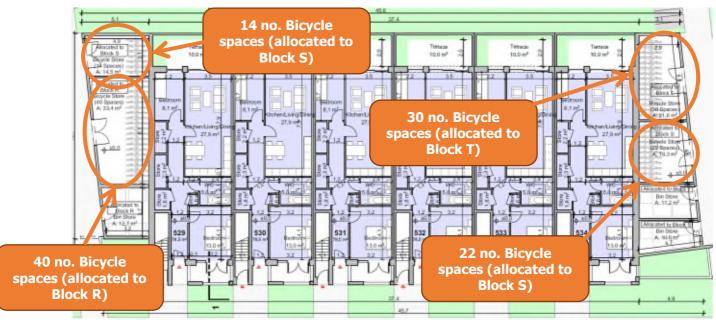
Block S Ground Floor Layout (Delphi Architects drawing no.
